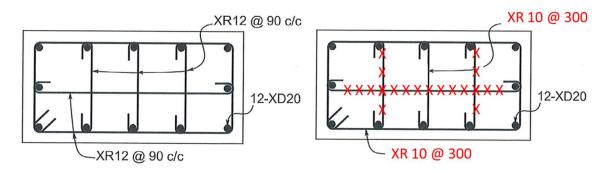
Original (left) and Modified (right) Red Book Columns. Crosses indicate omitted ties.
